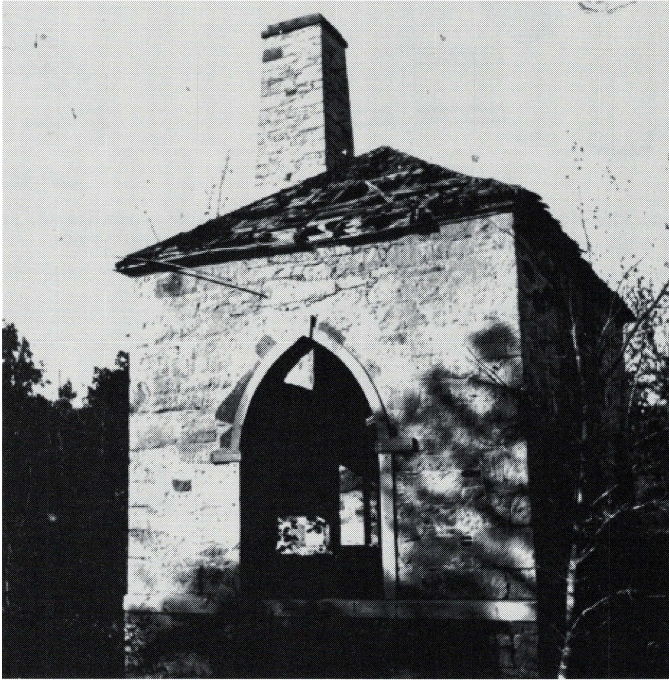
McCulloch's Gold Ore Mill Building, circa 1920. McCulloch's Engine House, or Castle McCulloch, as it is known locally, is of typical Cornish dry-laid stone construction.
